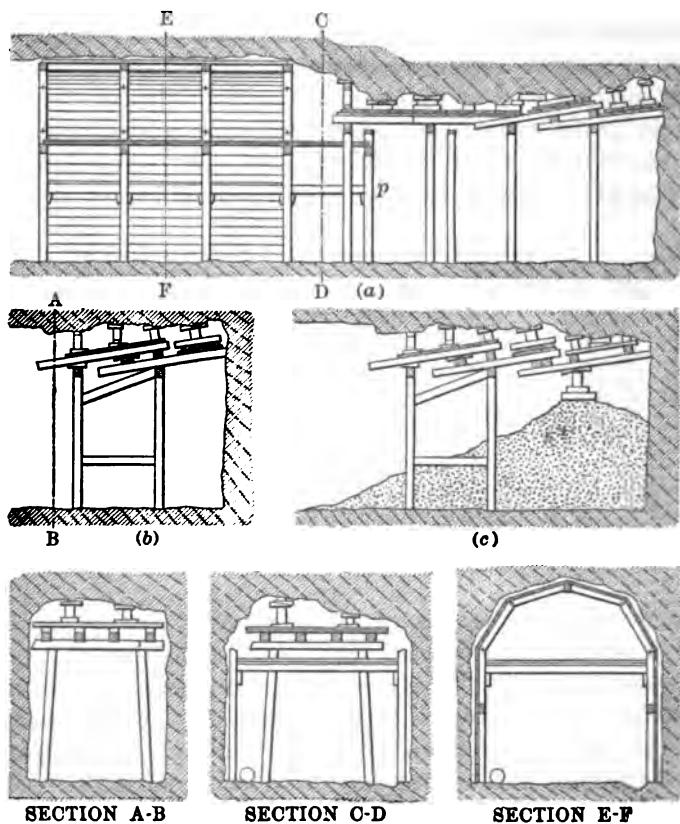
System of timbering used at the Elizabeth Lake Tunnel.
